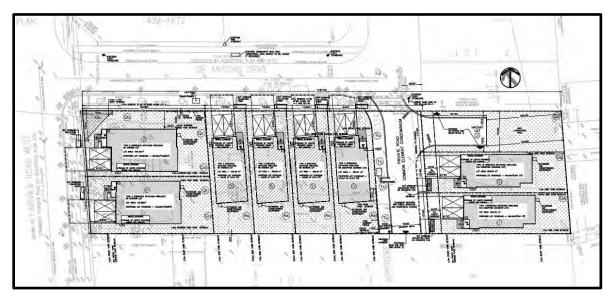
Site layout showing Draft plan of subdivision and CEC road. – (revised image 7 to reflect updated site plan)
